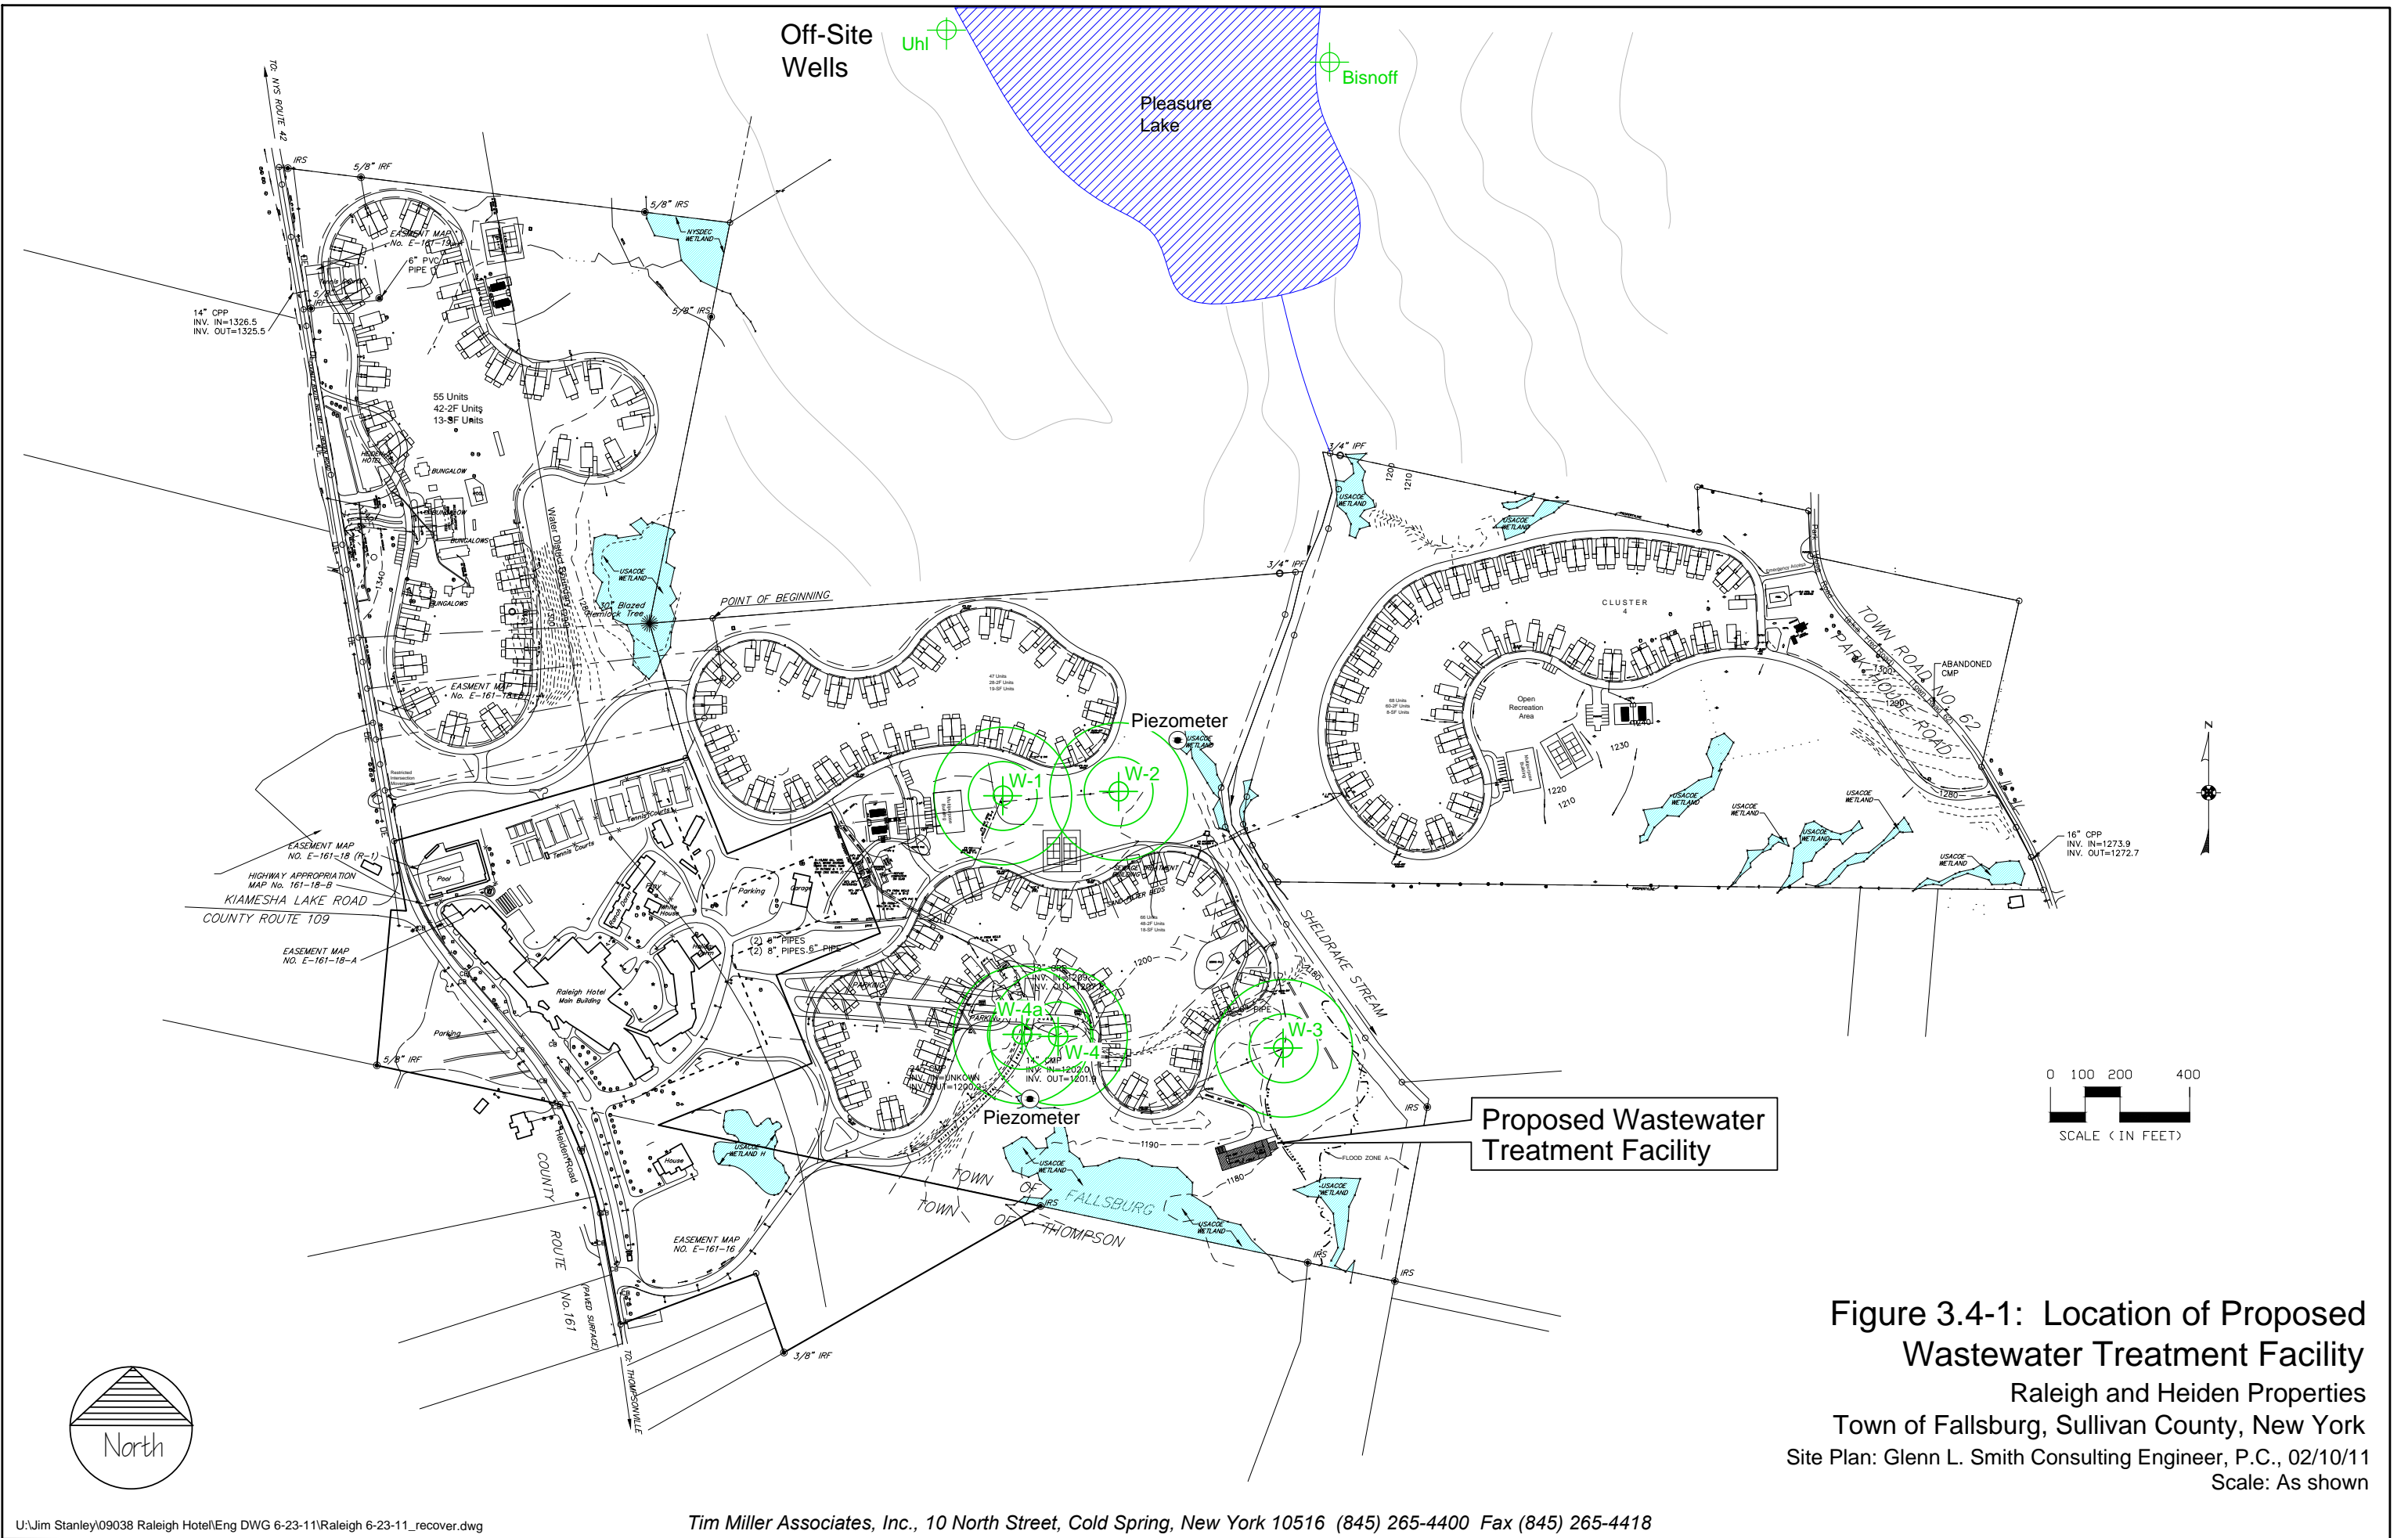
Location of Proposed Wastewater Treatment Facility
